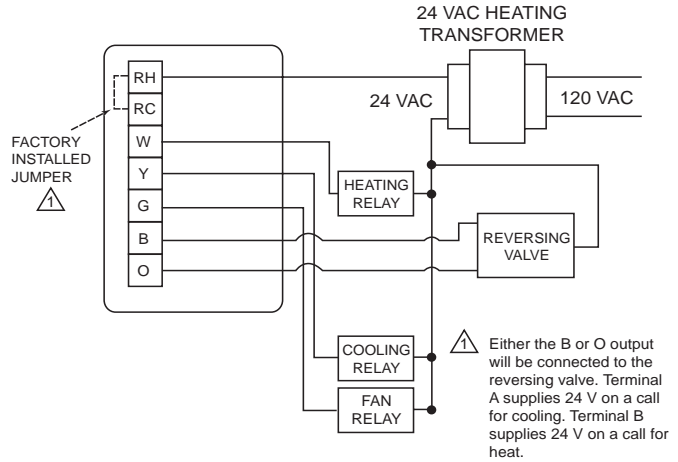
T207 Wiring to Heating/Cooling System With Single Transformer and Reversing Valve.
